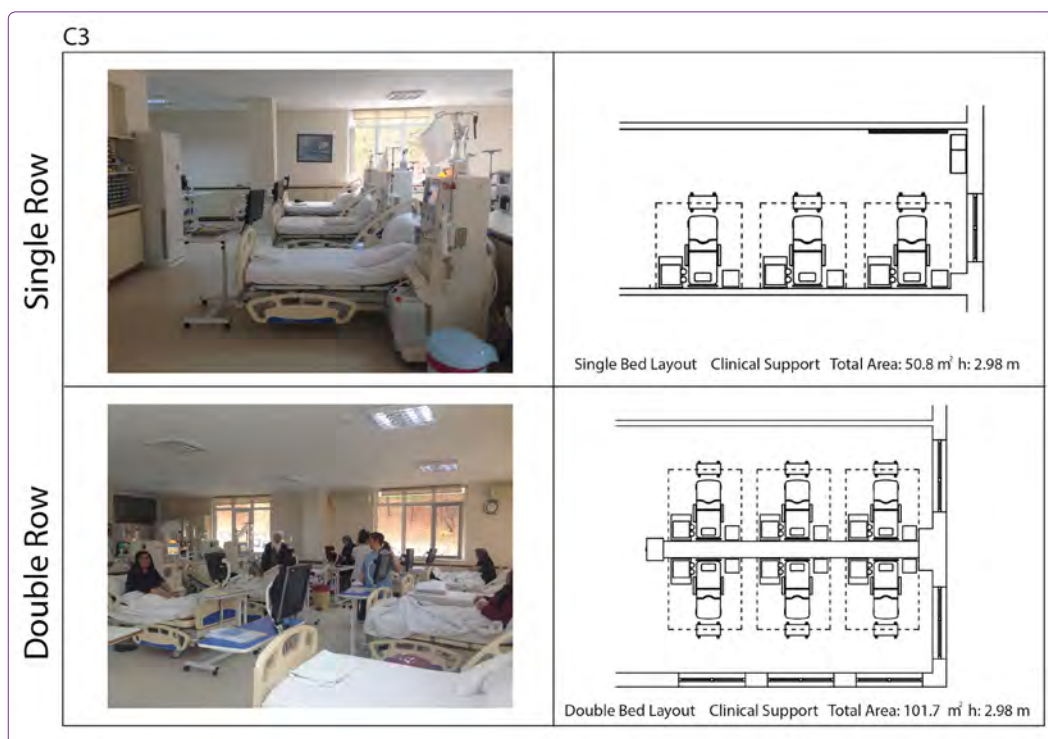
C3' Spatial Layout of single-doble bed treatment rooms.
